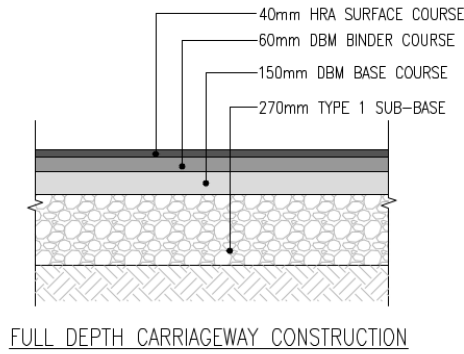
Typical cross section – Eastern link road (WSP)
